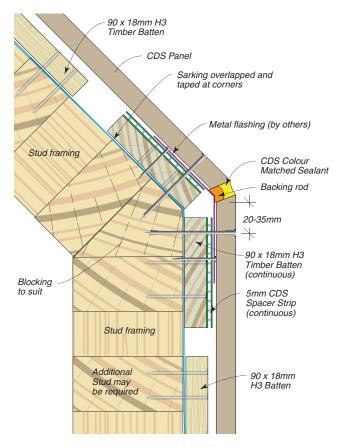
Internal Corner Detail – With Backing Strip and Colour Matched Sealant – Plan View
